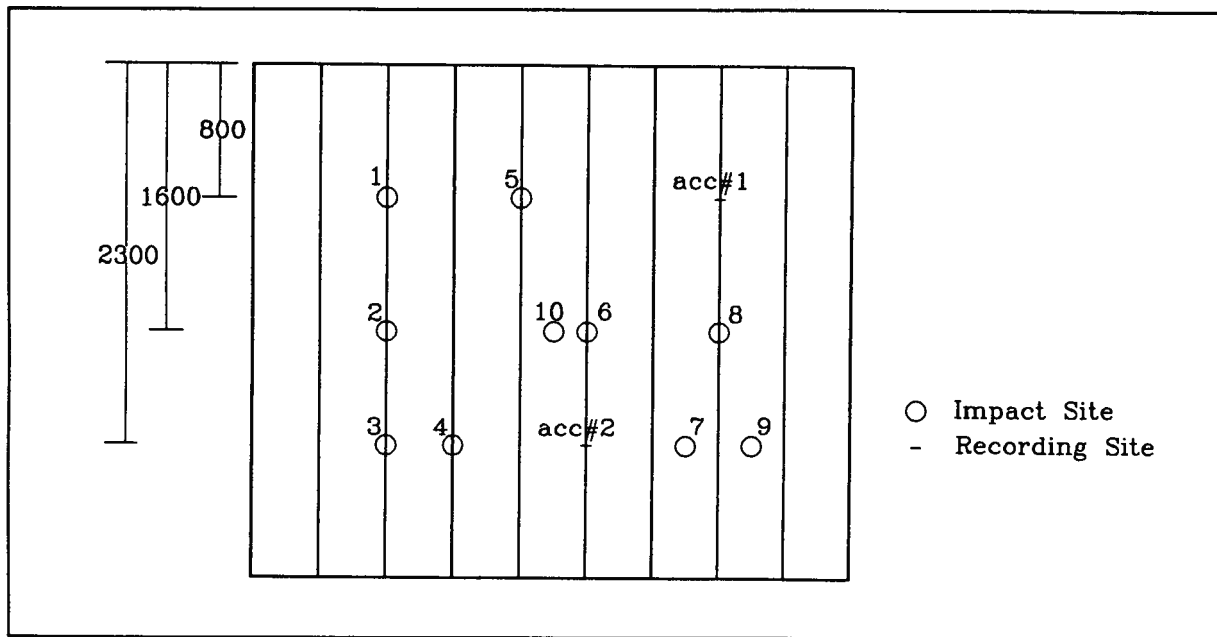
Impact and recording locations used on the 2x8 joist floor
